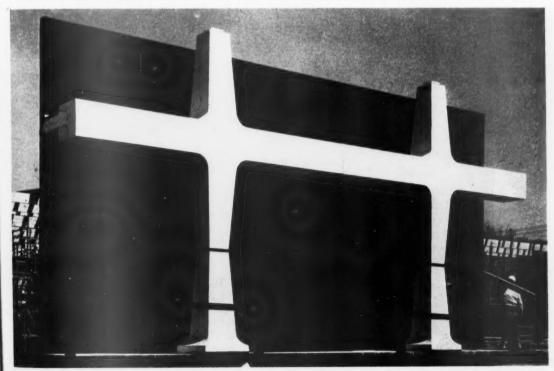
PHOTO SHOWS two typical units and two first floor units in an experimental mock-up. (Photo by Warner Studio).
